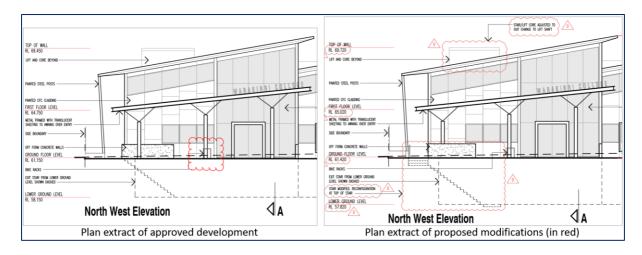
| Existing (left) and proposed (right) lift core and basement stairs (Source: Applicant's Modification Report, 2022)
